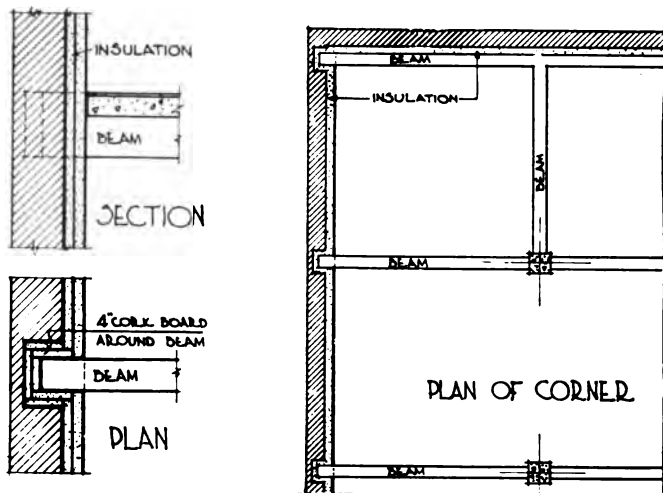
INSULATION OF BEAMS IN OUTSIDE WALL.
